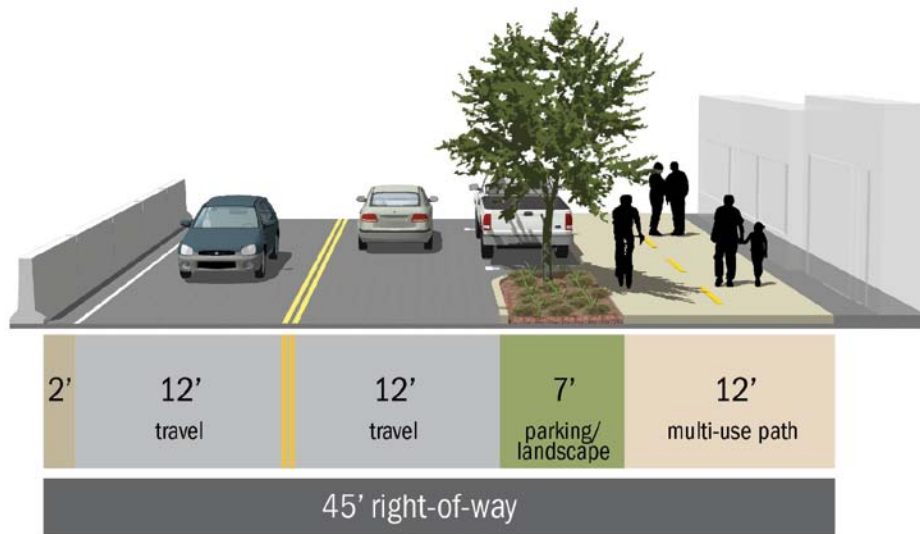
Conceptual Cross-Section for Main Street – Milport Road to Beta Street within existing right-of-way (looking north)
